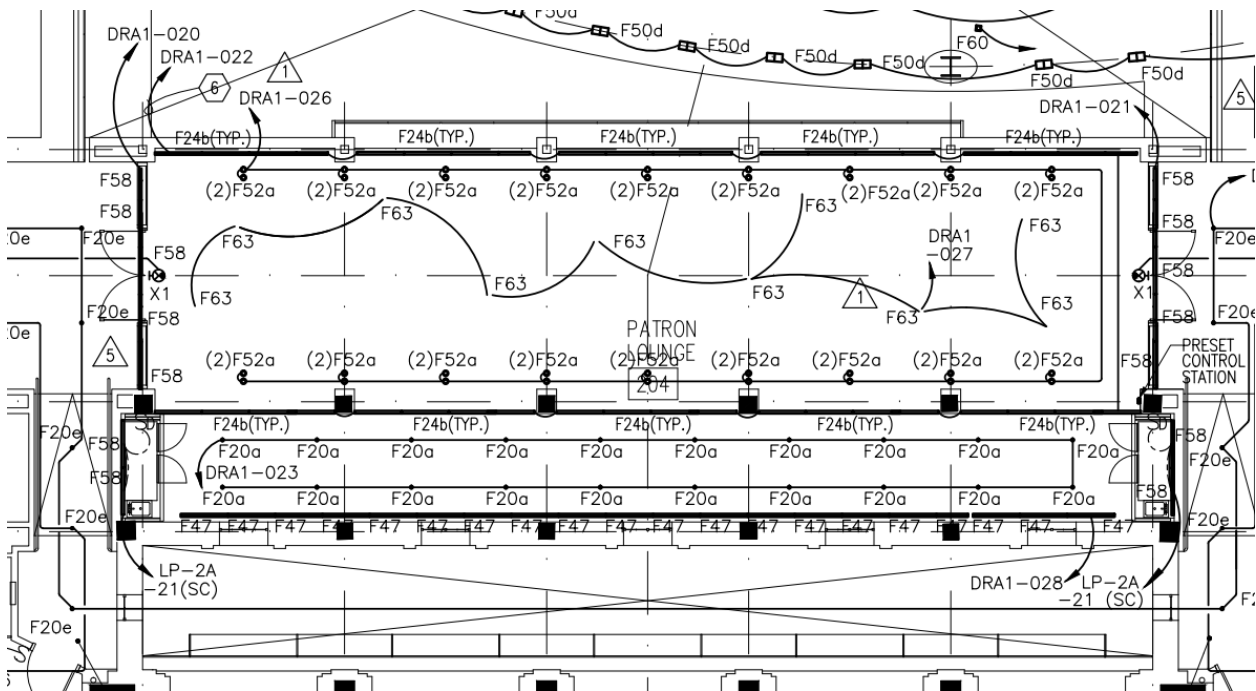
Patron's Lounge Reflected Ceiling Plan
